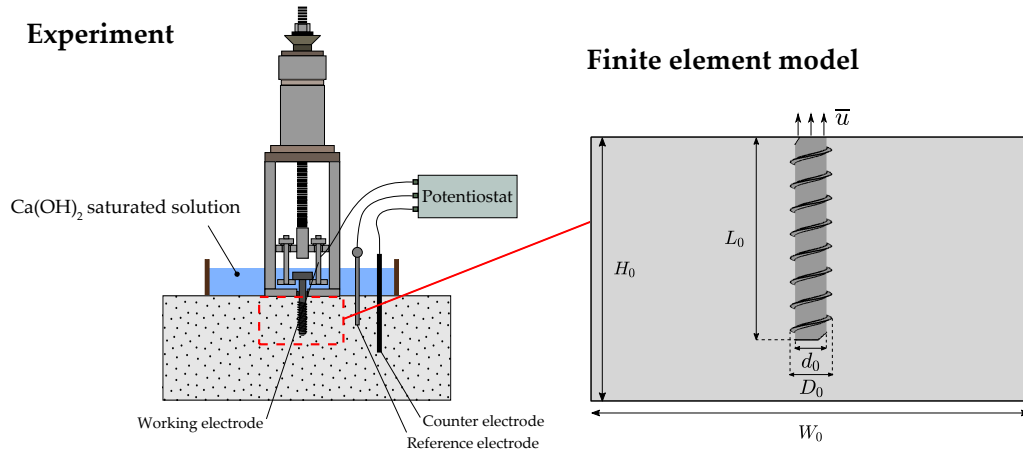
Setup of the concrete screw anchor test (left) and sketch of the finite element model (right). From [P4].
